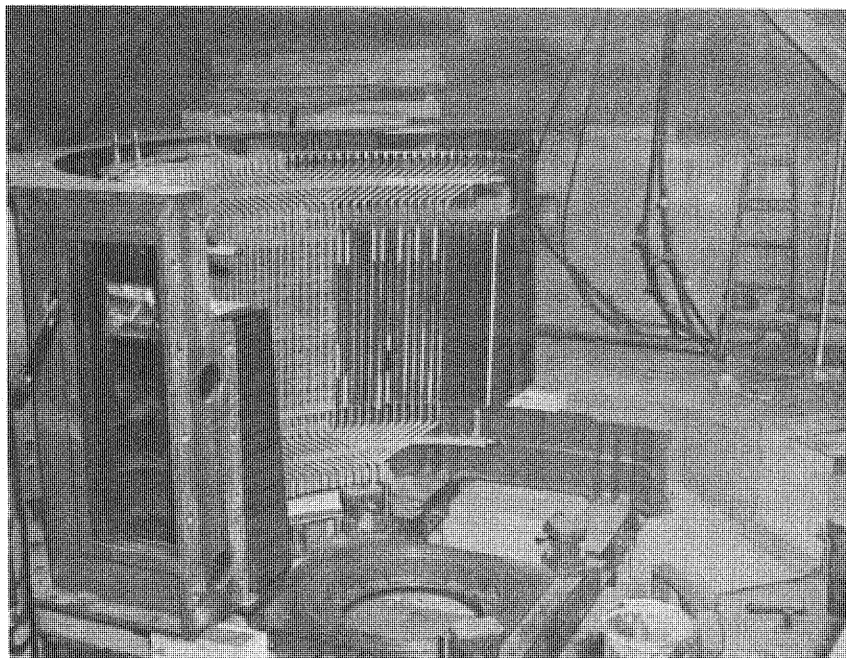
Half of stator for unit 1 in position over lower bearing bracket support. P783-908-1670, August 9, 1954.
